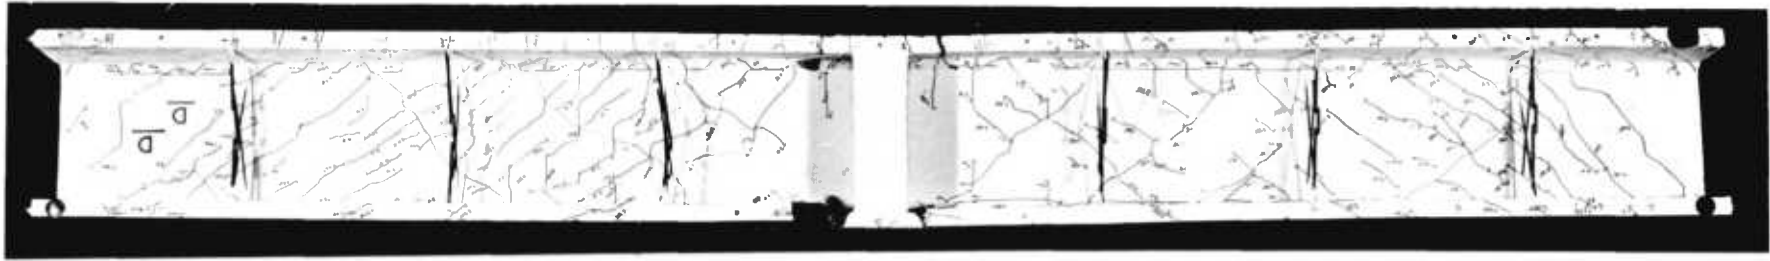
Crack Development on Channel Section with Double Stirrup Reinforcement
